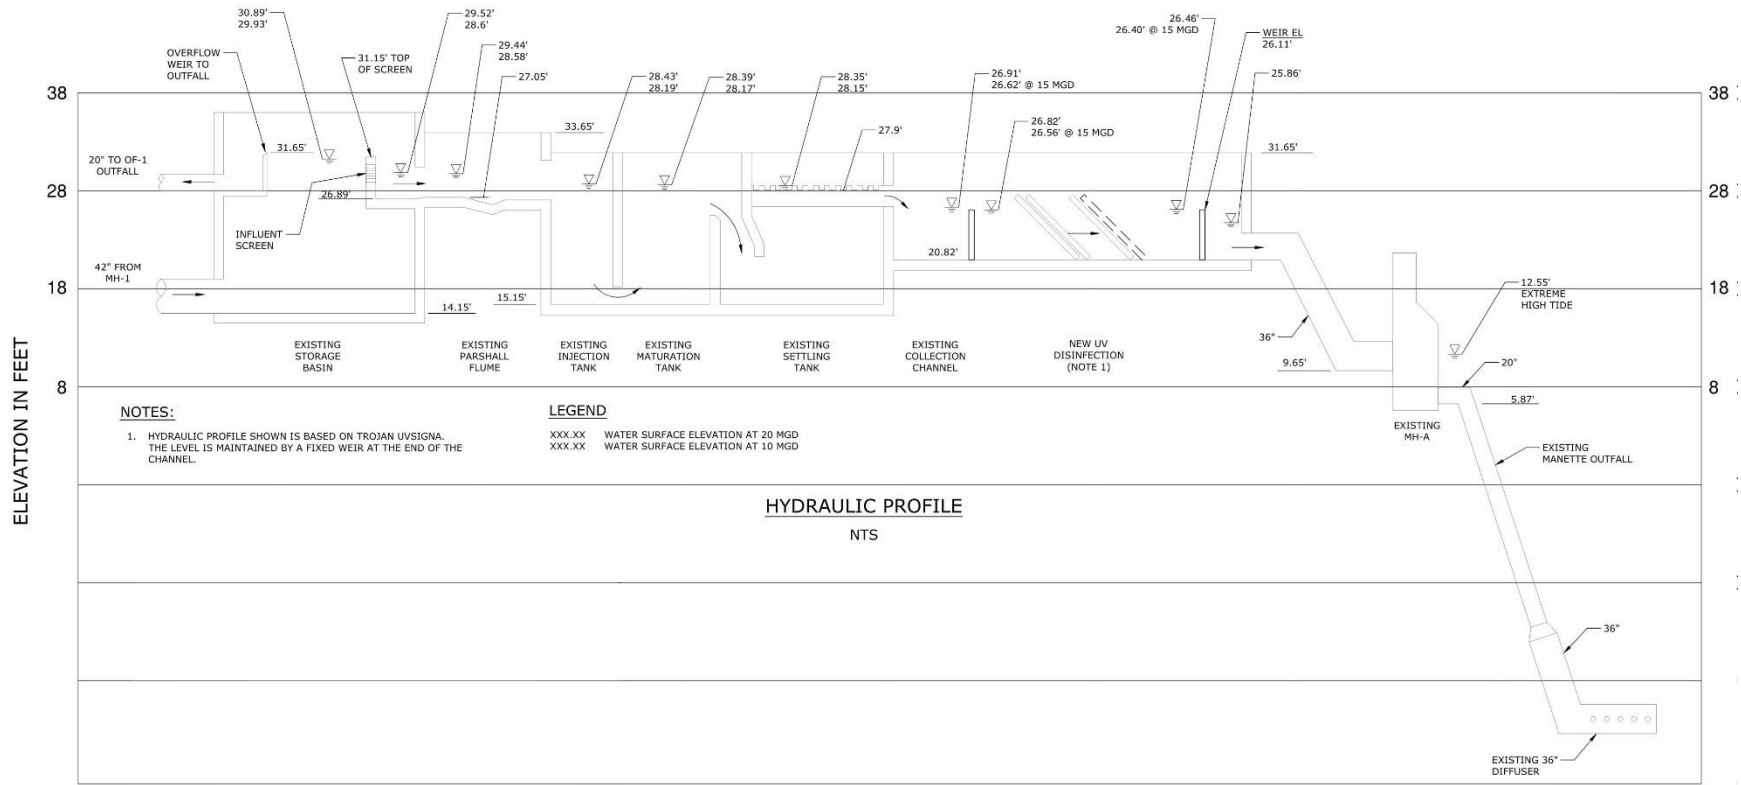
| Bremerton West Plant Future Hydraulic Profile
